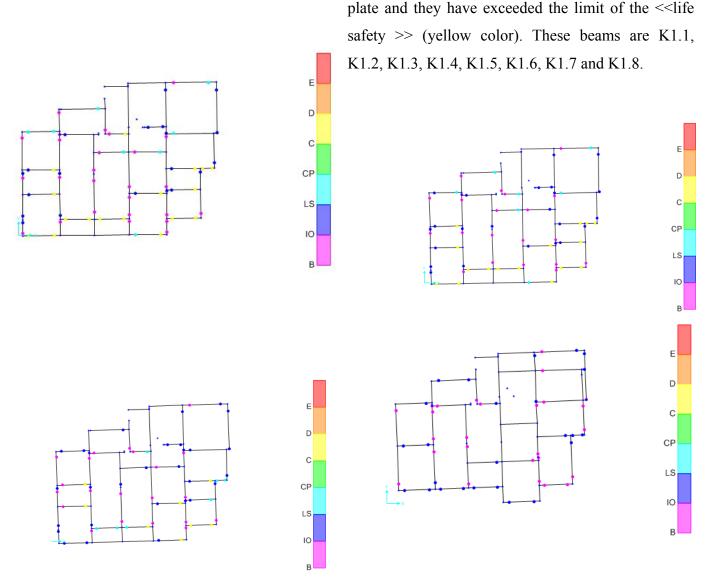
The plan views of the floor 2, 3, 4, 5 at the performance point at y direction
